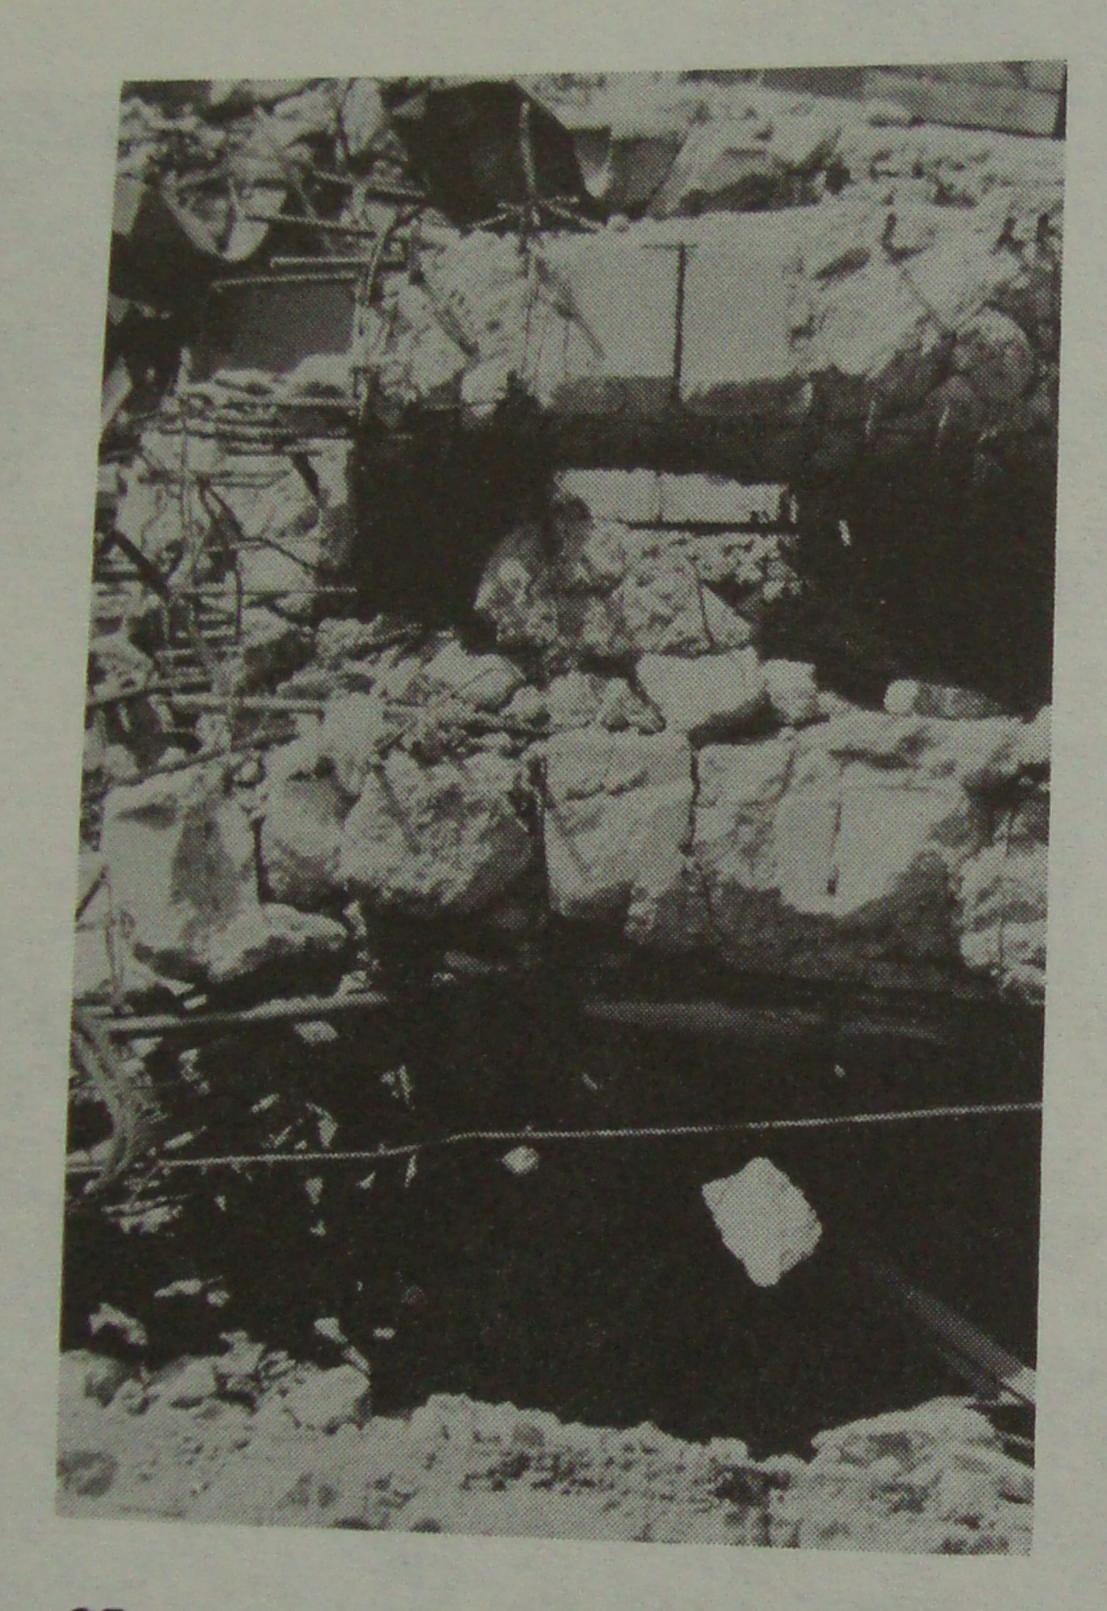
Punching shear failures in 4 storey school structure with embedded hollow block masonry in floor slabs.
